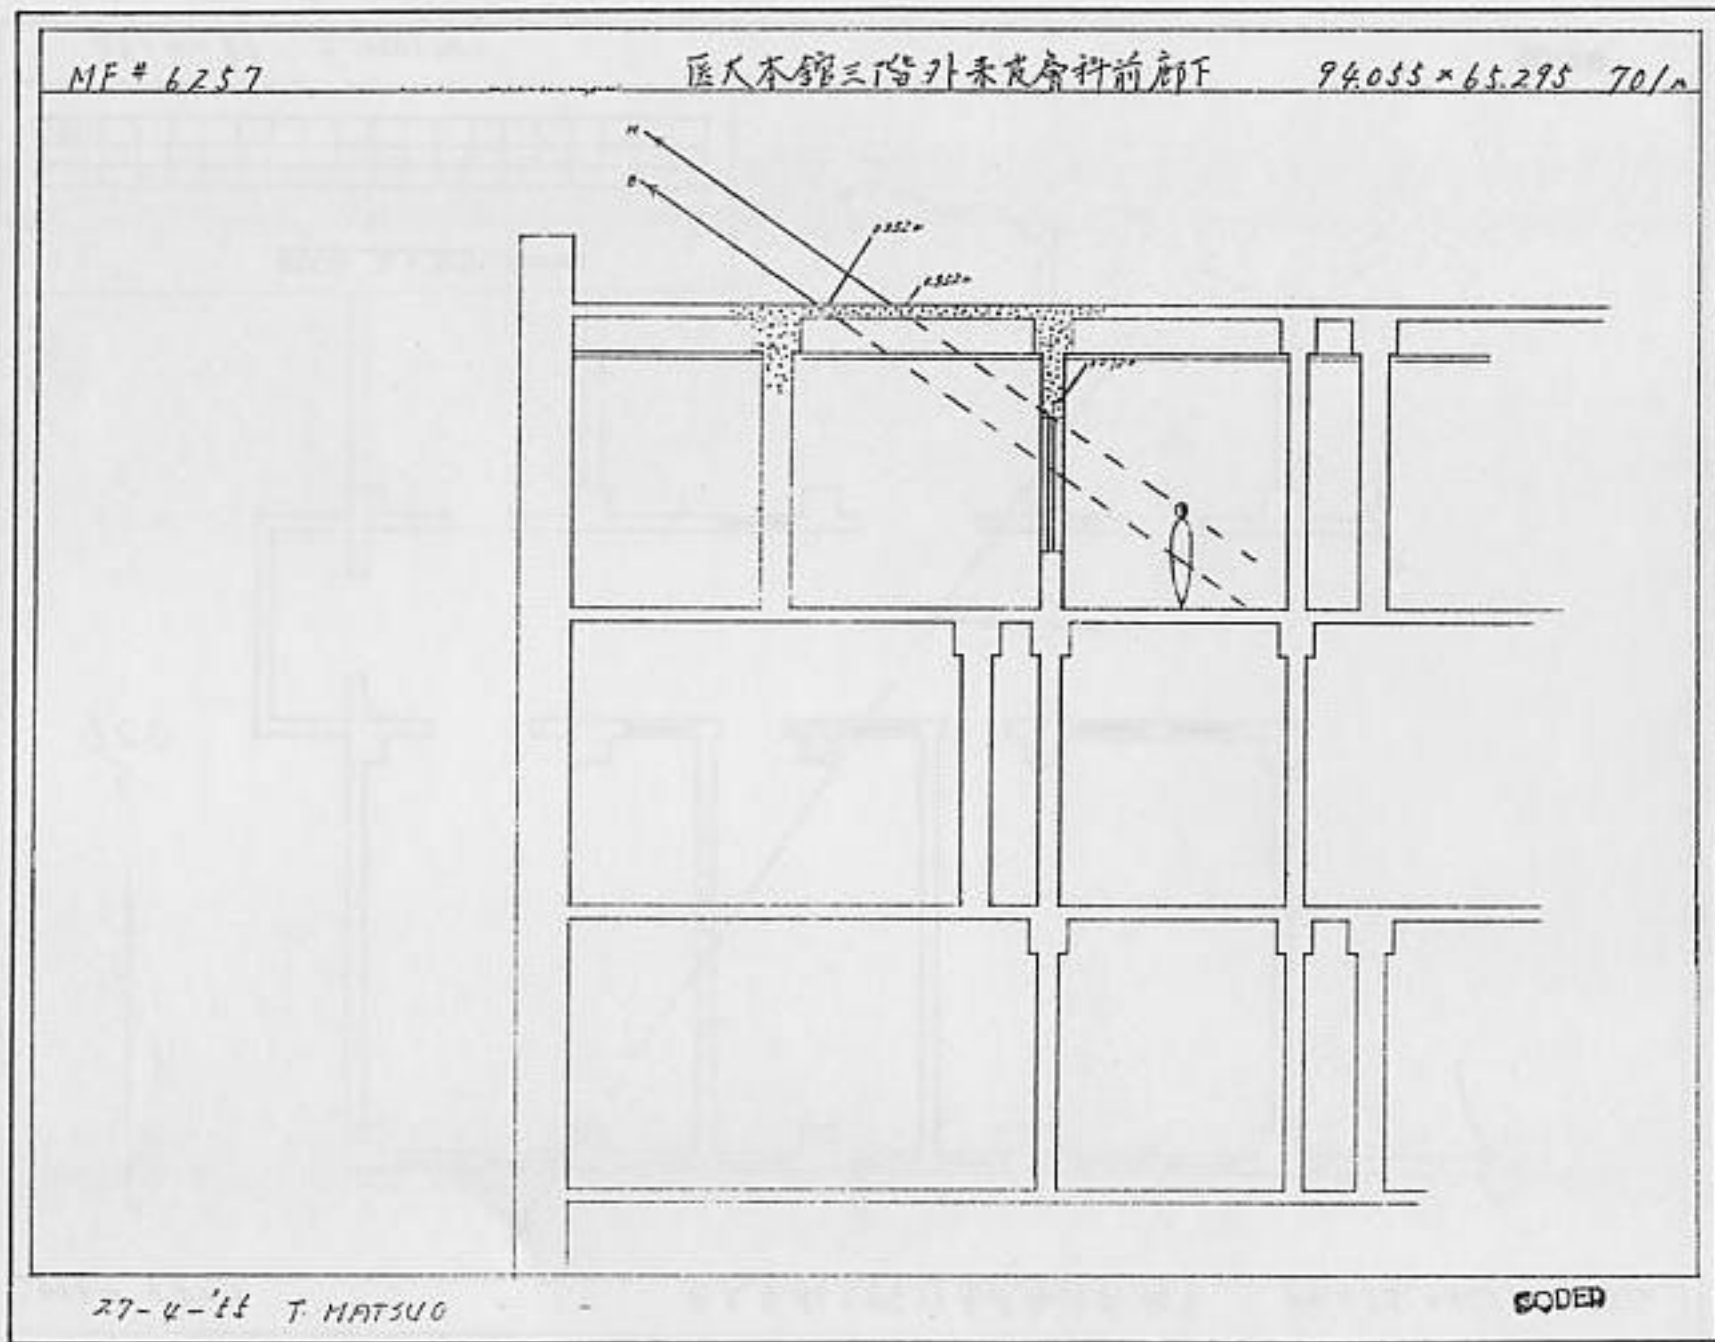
Elevation for the floor plan of the survivor shown in Figure 5
